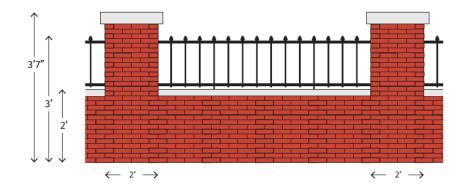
3 Foot Wall/Fence Along Stafford Road
